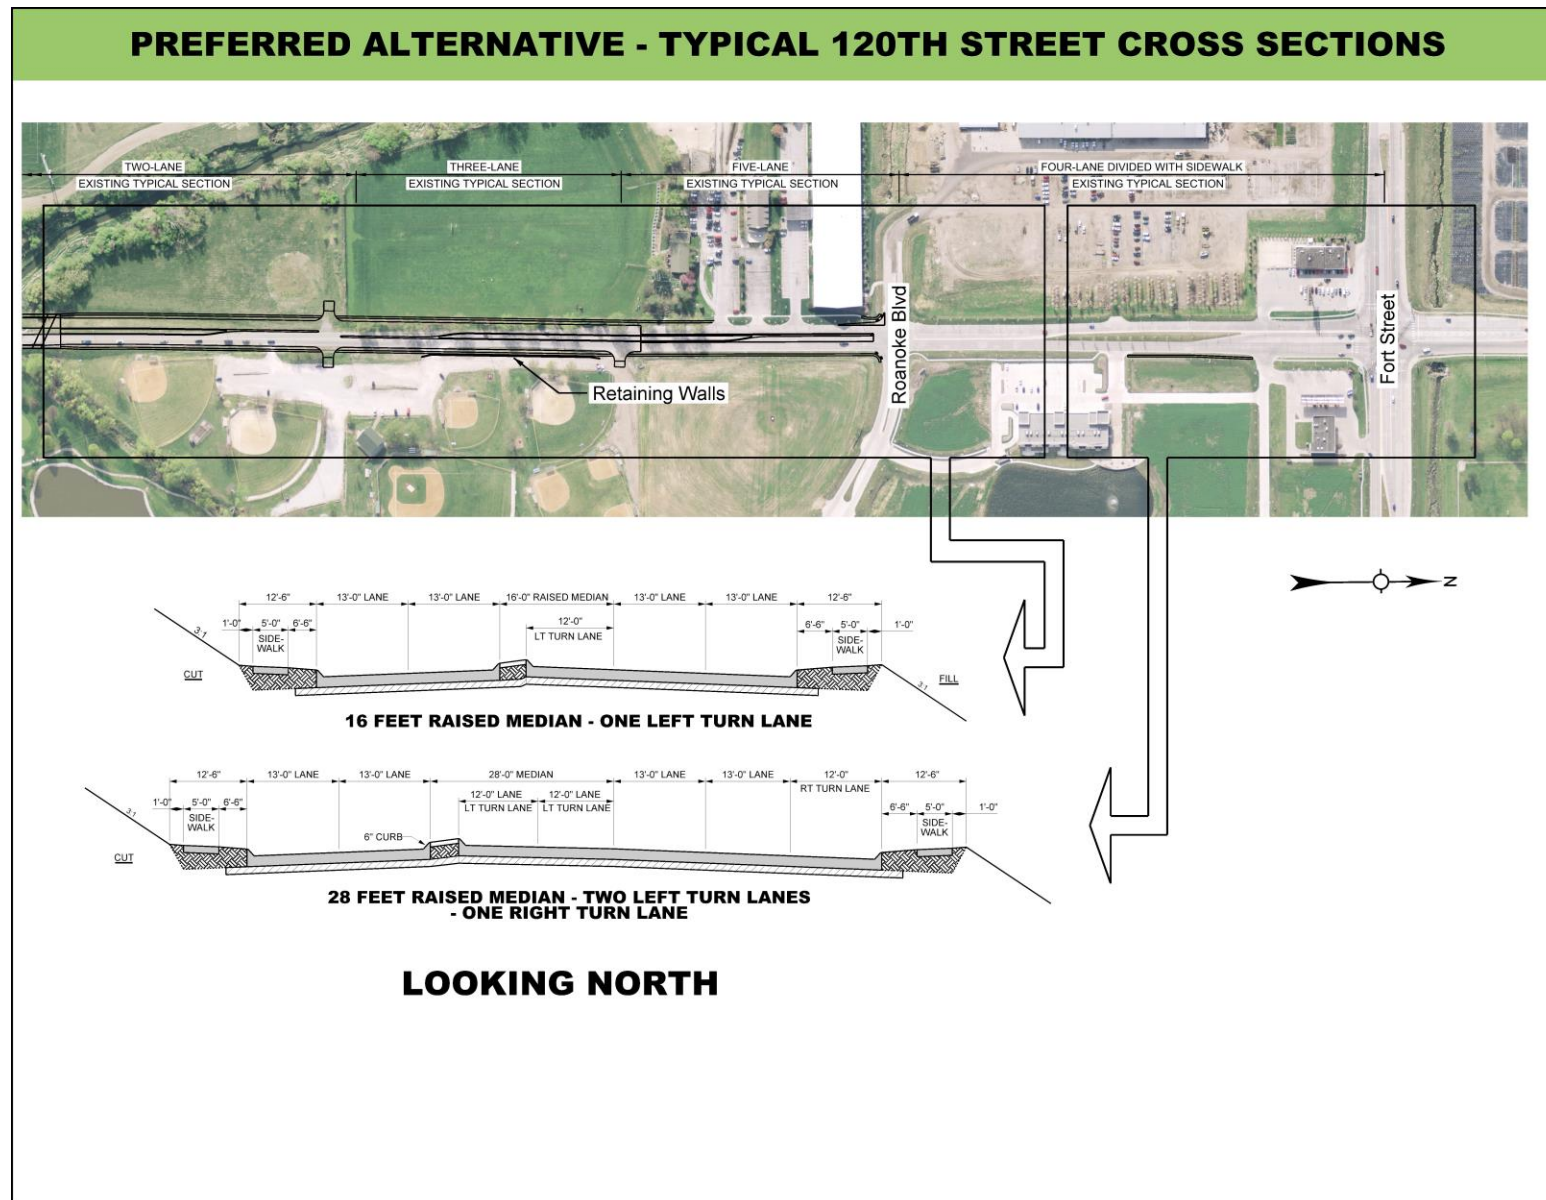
B. Preferred Alternative – Typical 120th Street Cross Sections
